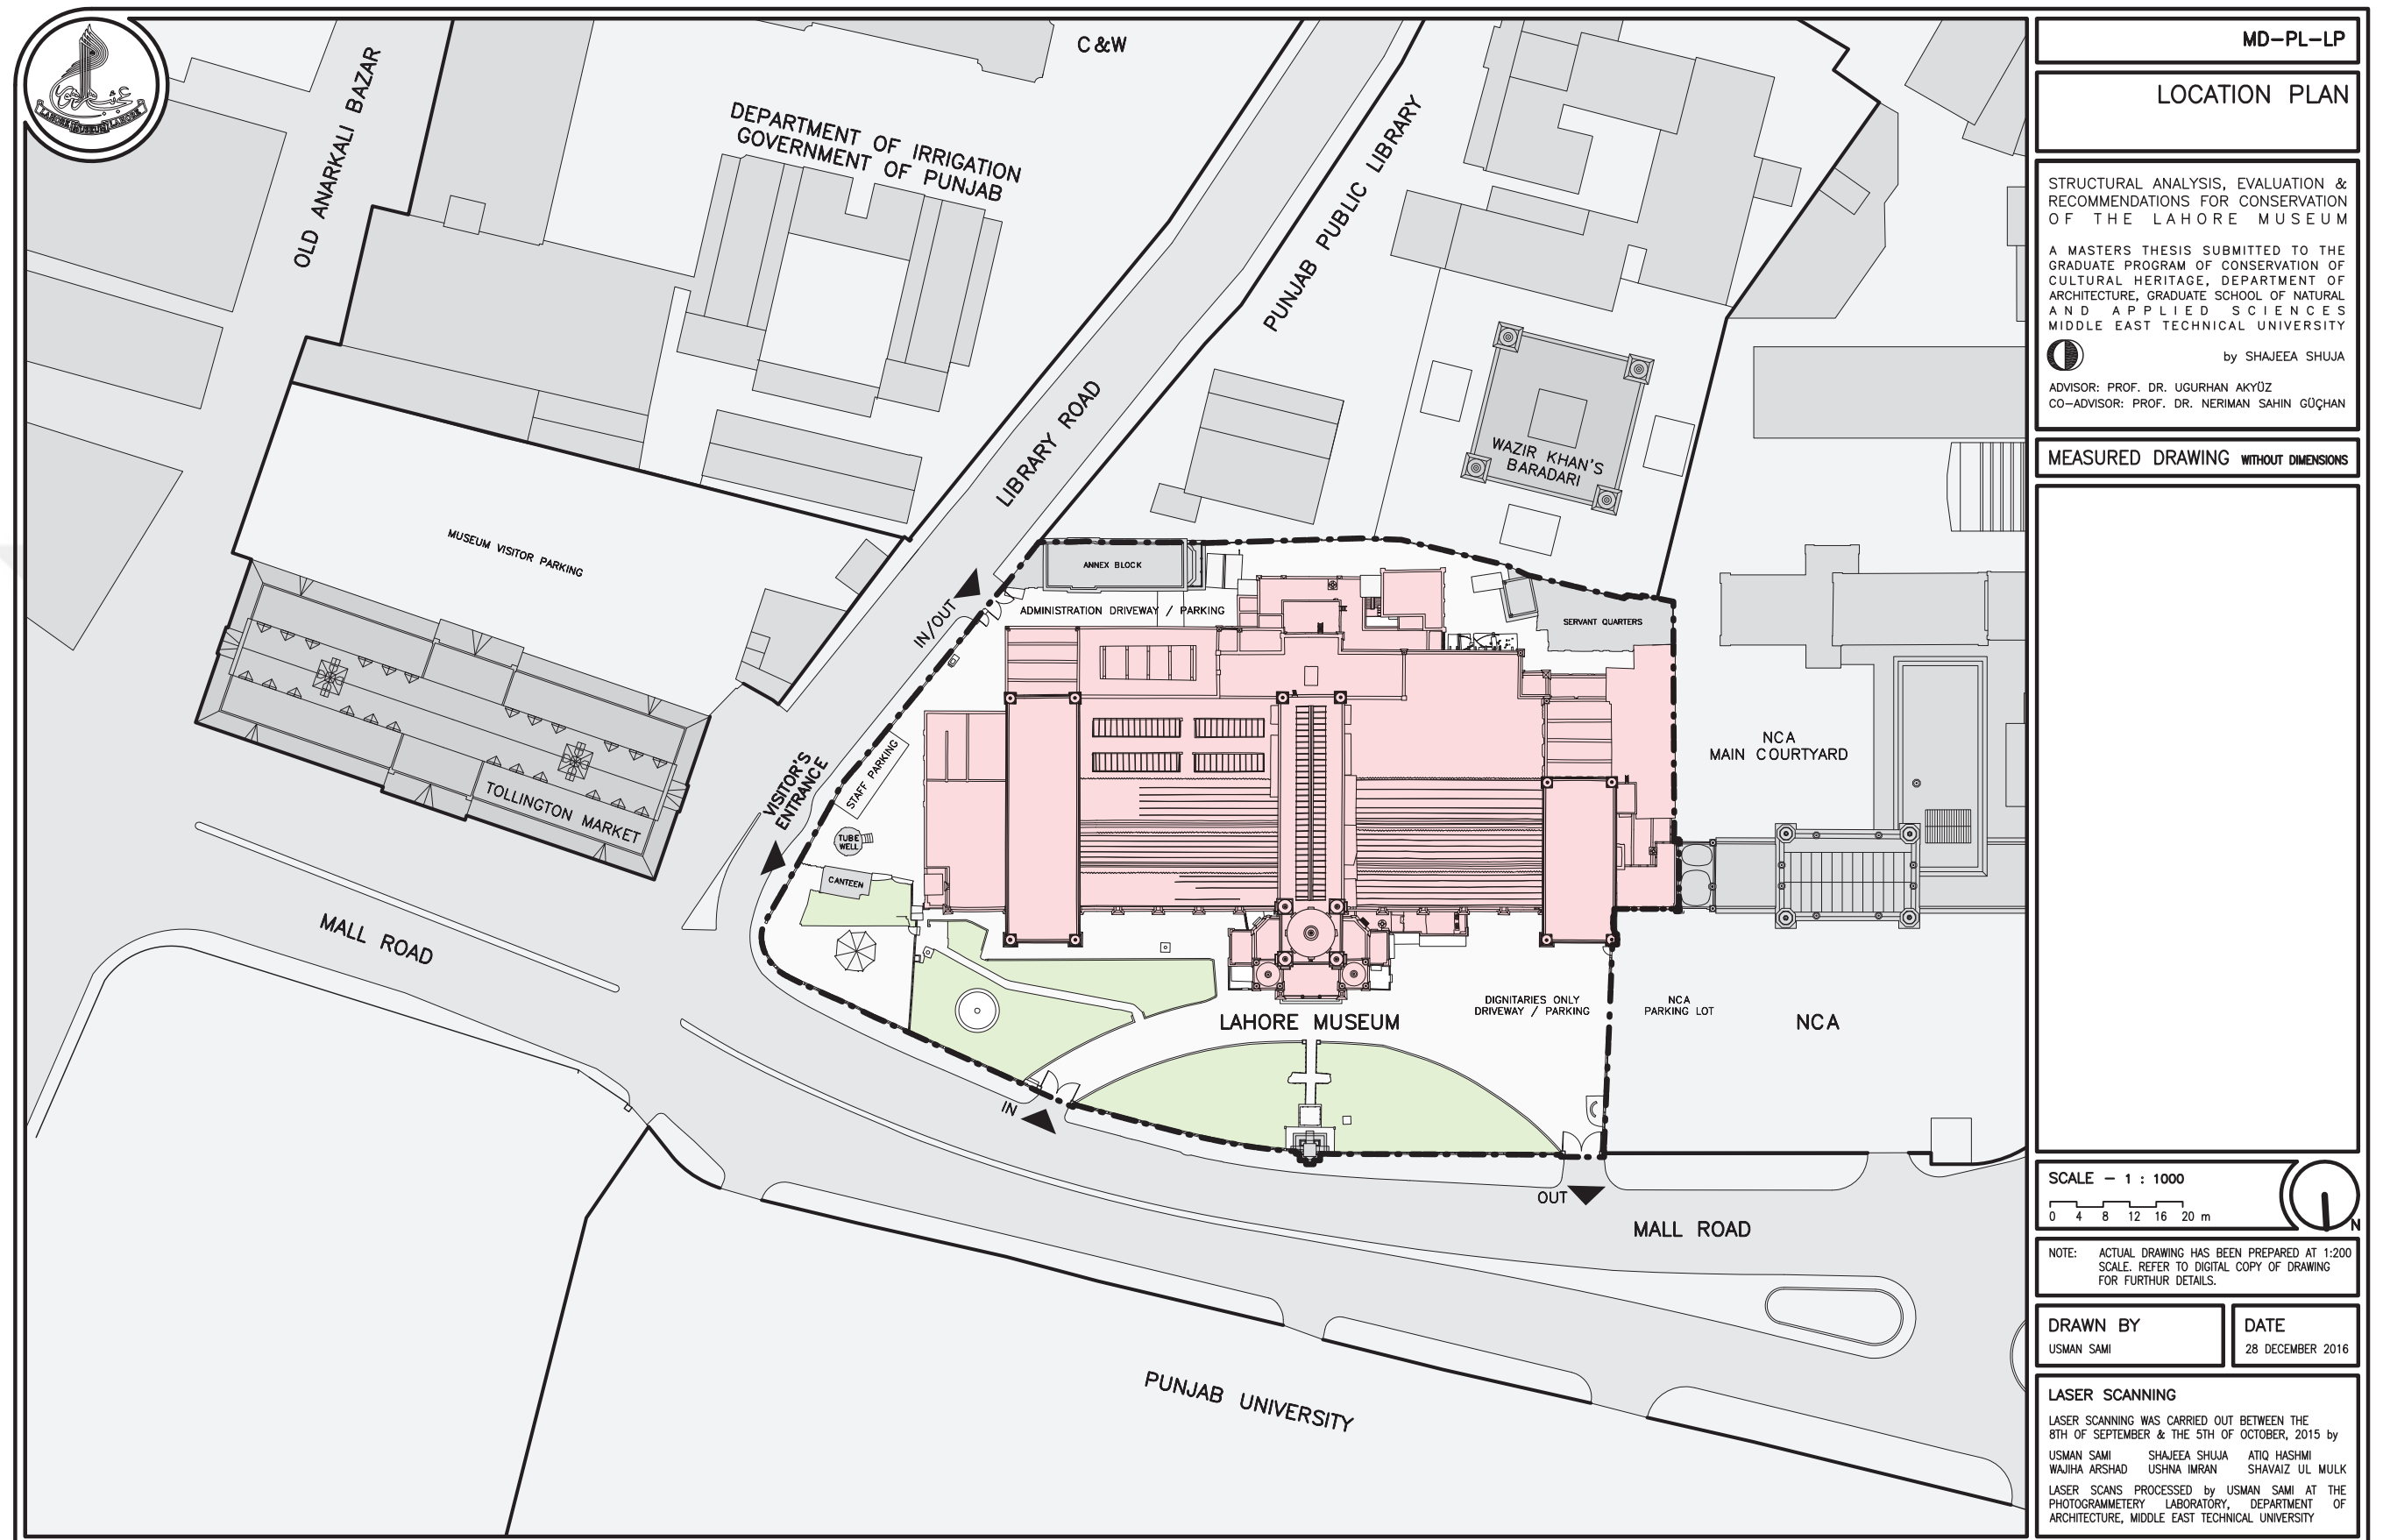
MD-PL-LP – Measured Drawing – Location Plan (2016)
